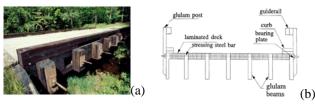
Transversal post-tensioning: (a) Experimental Vierendeel truss deck at Mormon Creek, North Michigan (b) Schematic view of the T-beam stress laminated timber deck [7]
